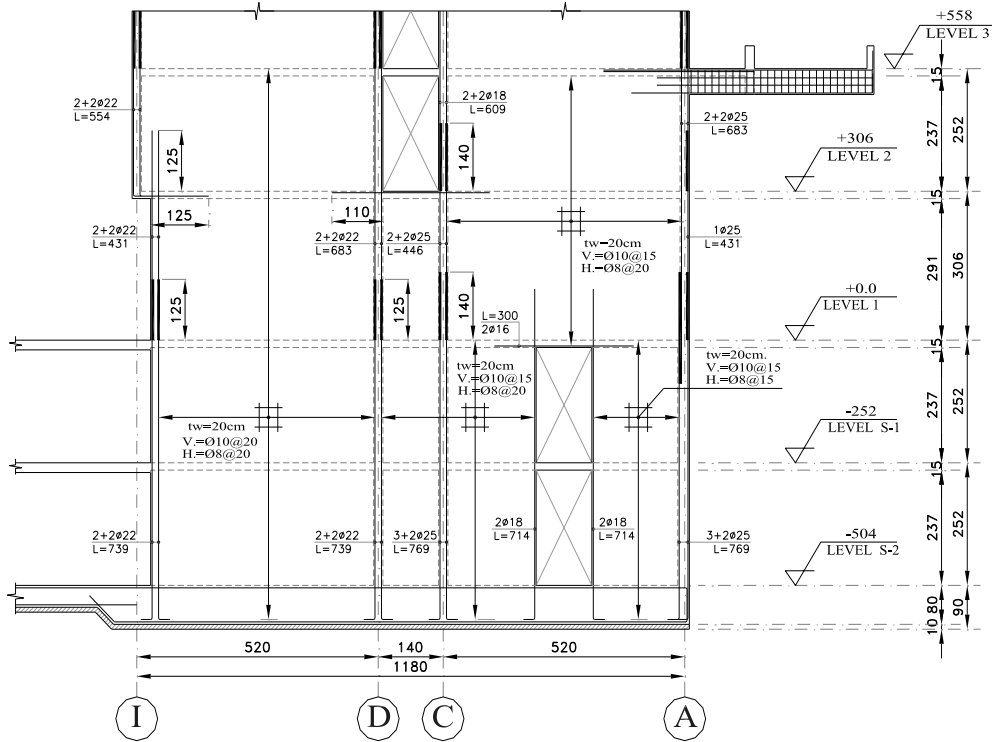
Alto Rio building axis 8 elevation view (Unit: cm) (Note: 1 cm = 0.3937 in)
